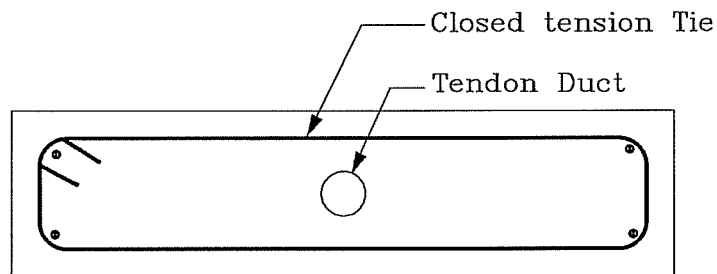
Typical Detail for Tension Ties in Anchorage Zones
